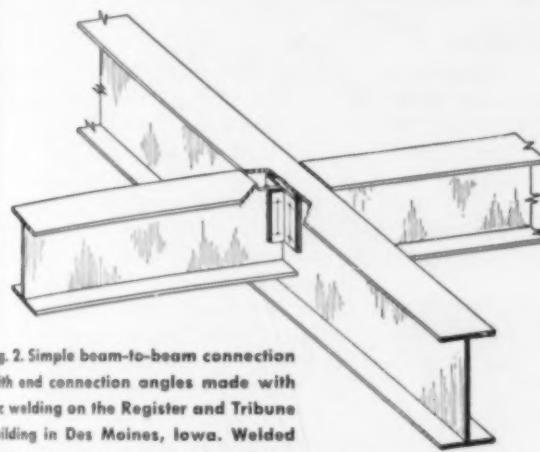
Simple beam-to-beam connection with end connection angles made with arc welding on the Register and Tribune Building in Des Moines, Iowa. Welded design assures exact span length for beams and exact spacing of main girders.
